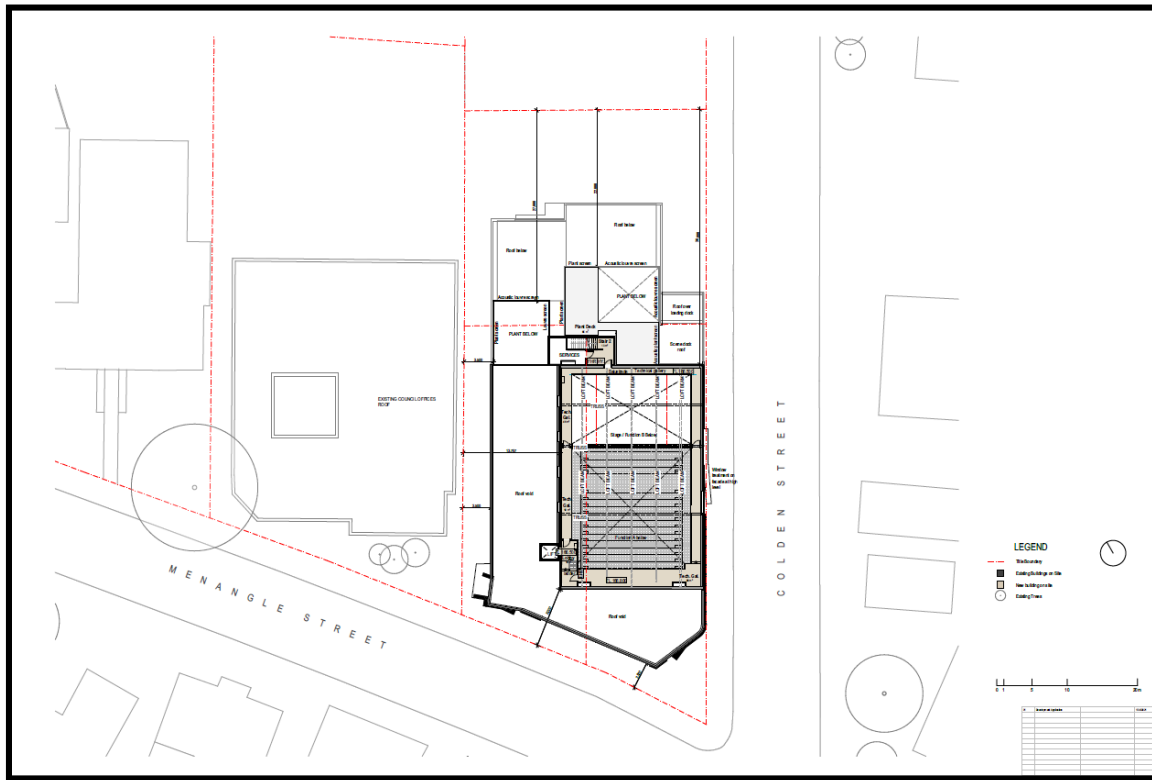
Proposed First Floor Plan (Source: William Ross Architects)
